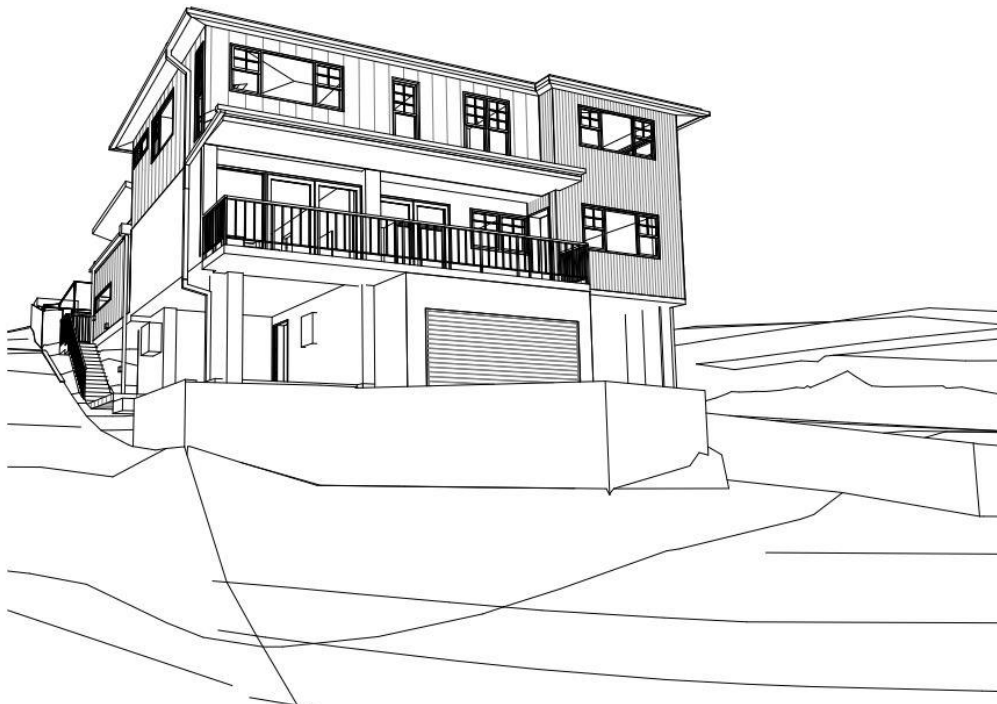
Proposed Perspective (Source: Zugai Strudwick Architects)
